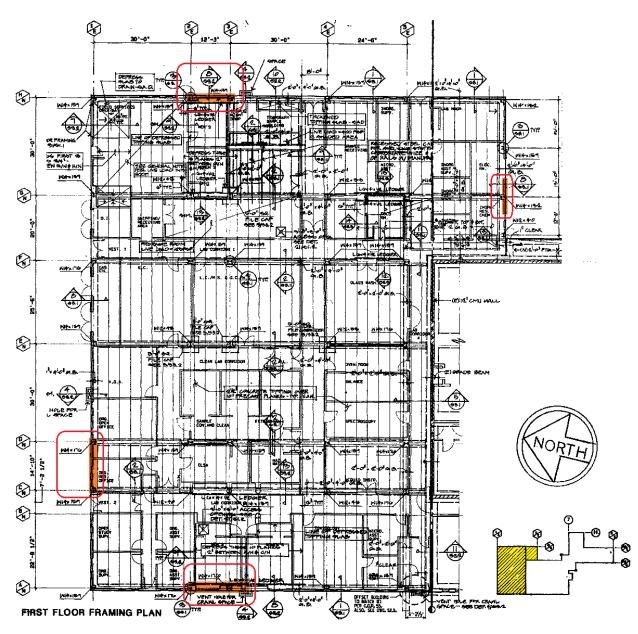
North Lab Addition – Framing Plan Showing the New Shear Walls
